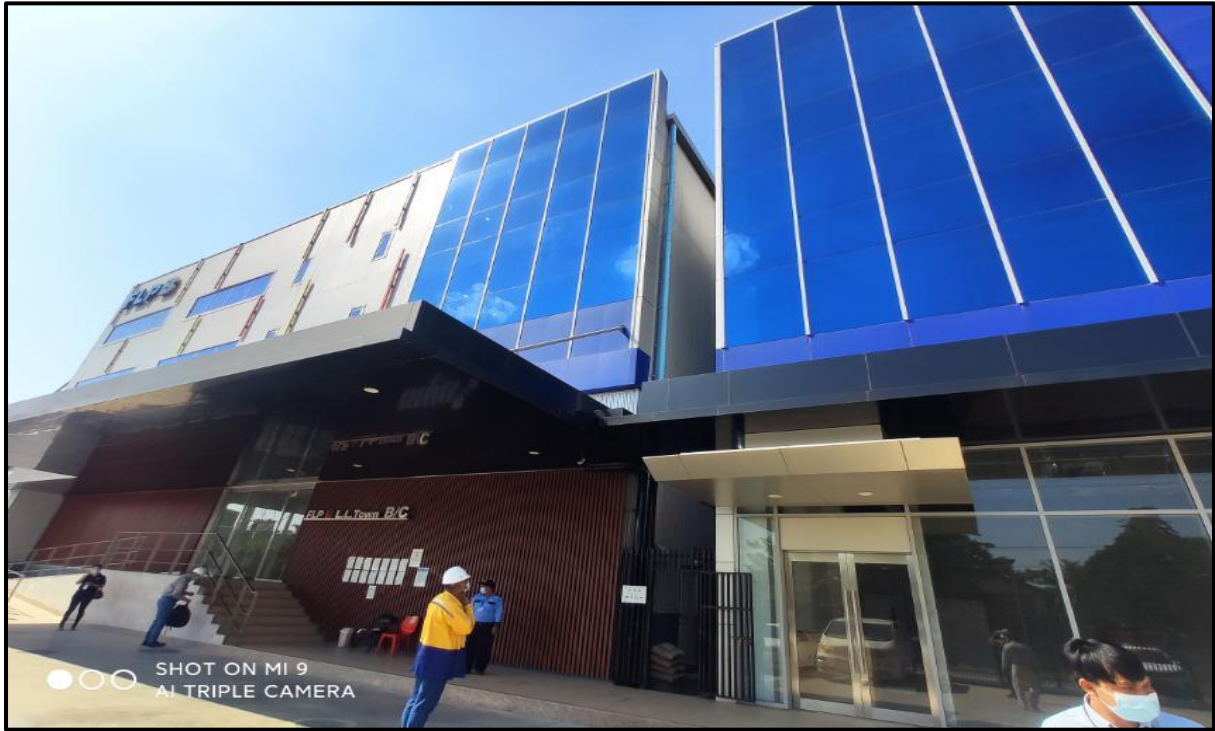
View of the Building B and Building C interconnected through Walkway
